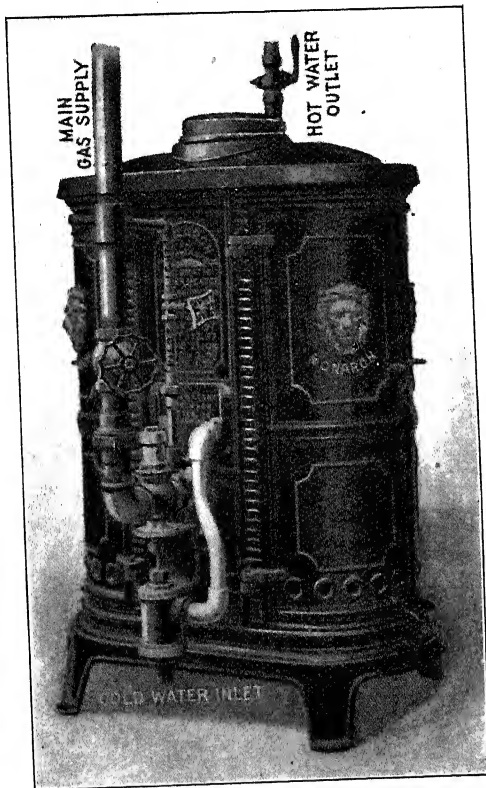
View of Pittsburgh Gas Water Heater. Closed.
